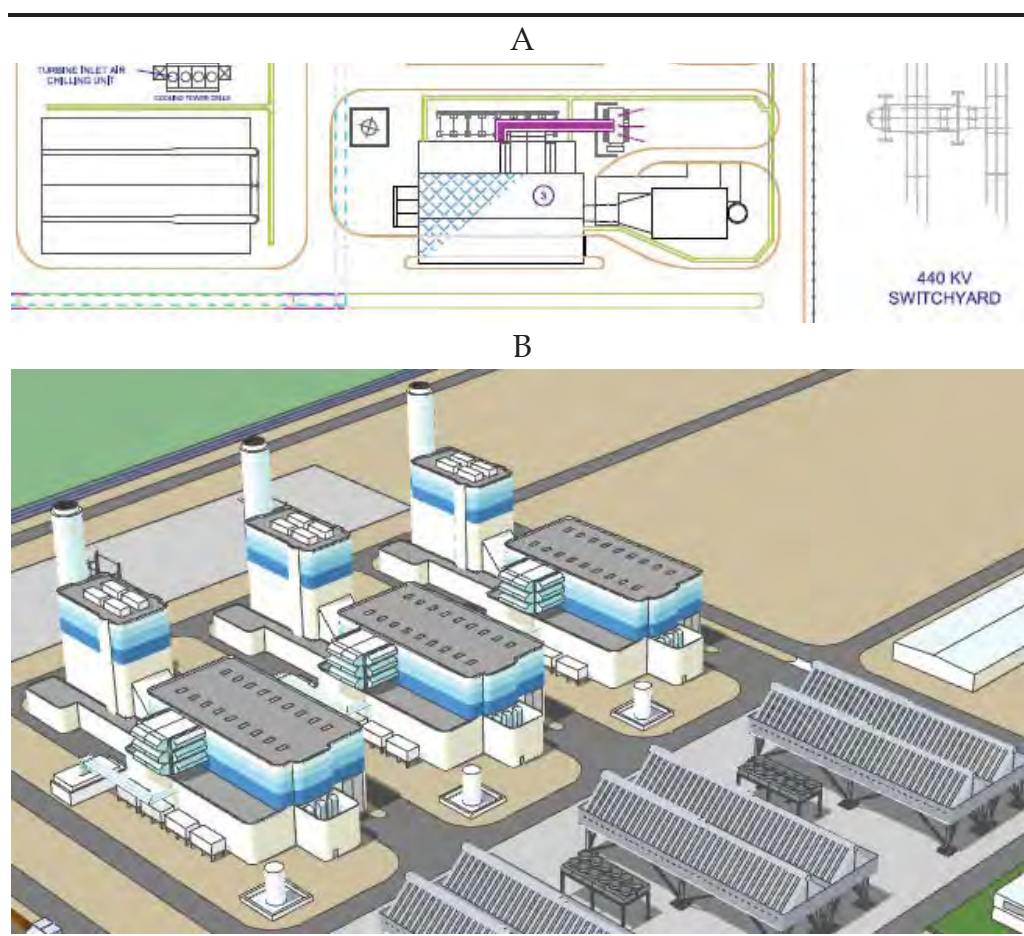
132kV, 300MWe Block layout (A) and 3D rendering (B)
